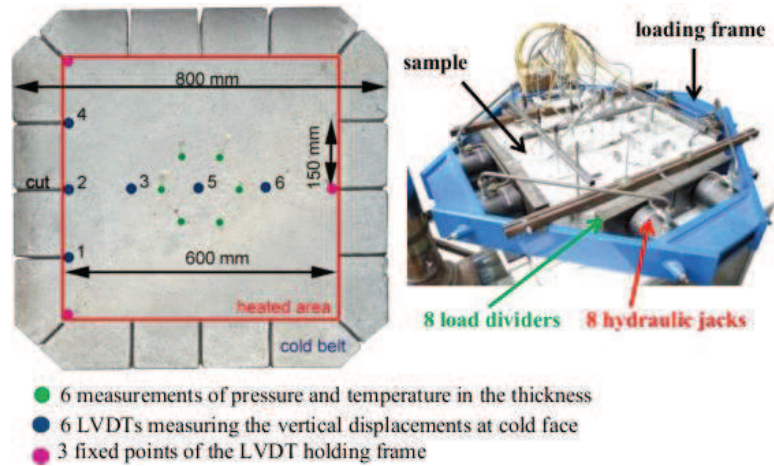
Concrete slab and measuring points (left); biaxial membrane loading system (right).
